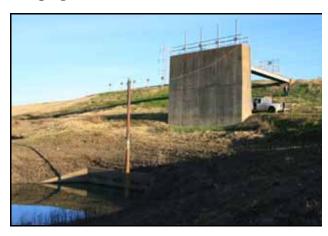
Pumping Plant B (Baker) Outlet Gate Structure
